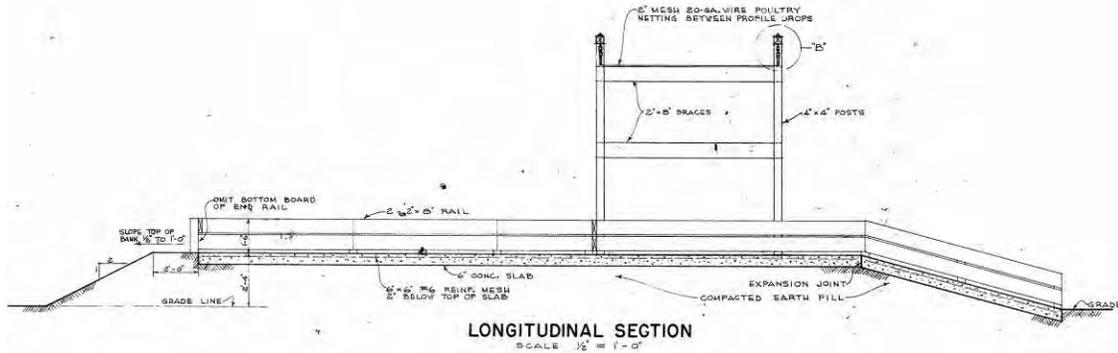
C-123 concrete mock-up for air movement training, ramp longitudinal section, Fort Bragg, NC, 1951 (standard drawing 28-13-57a sheet 1 of 1; C-123 mock-up for air movement training, concrete alternate, slab on fill; 7 December 1951).
